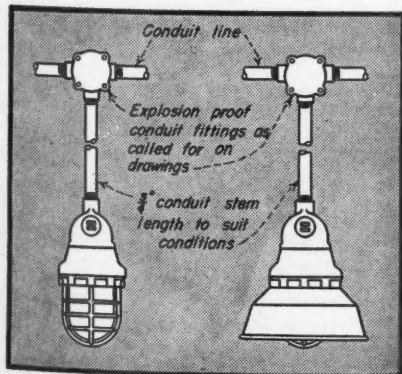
Installation technique for explosion-proof lighting fixtures.
